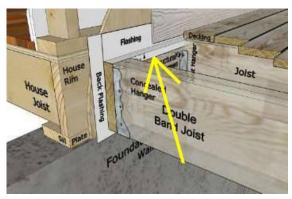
The flashing highlighted here is missing from under the back porch.
